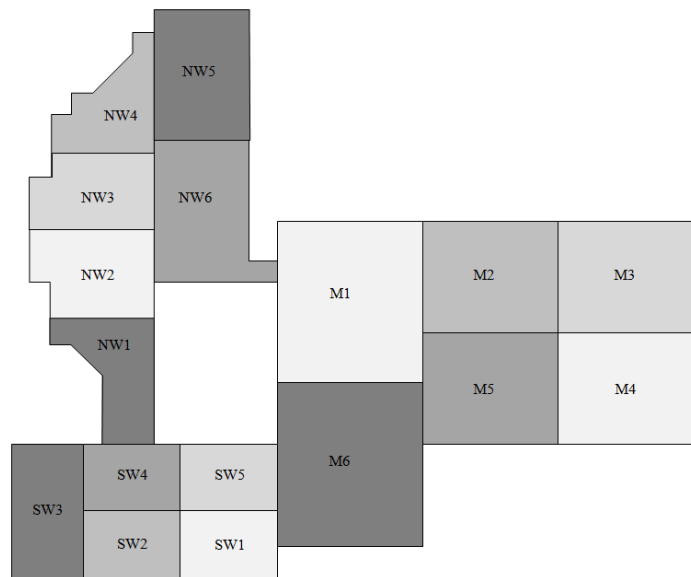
| New Sequencing Plan for 7700 Arlington Blvd. with Original Phasing
